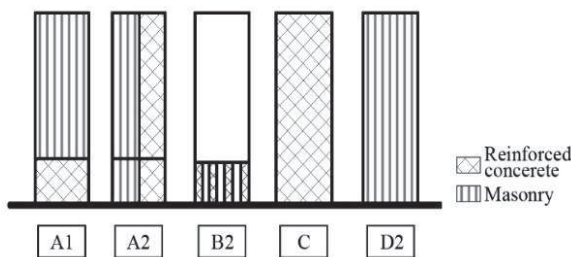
Specific types for typical Swiss buildings (figure adapted from: Lestuzzi et al, 2017).
